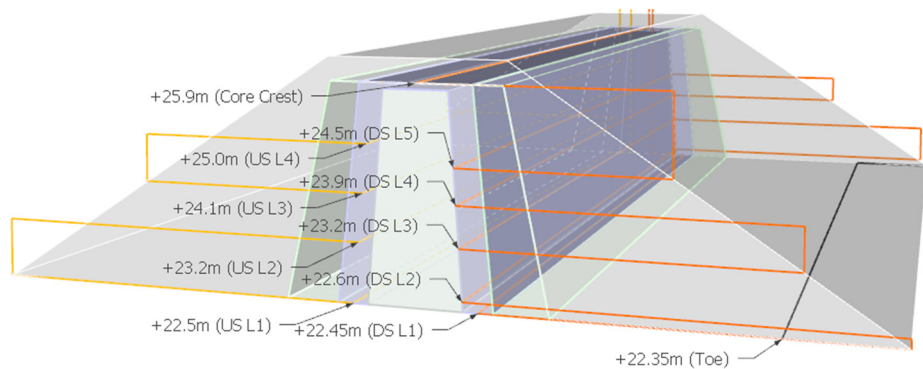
Cross section of the dam showing the three installed cables (Yellow, orange and black).
